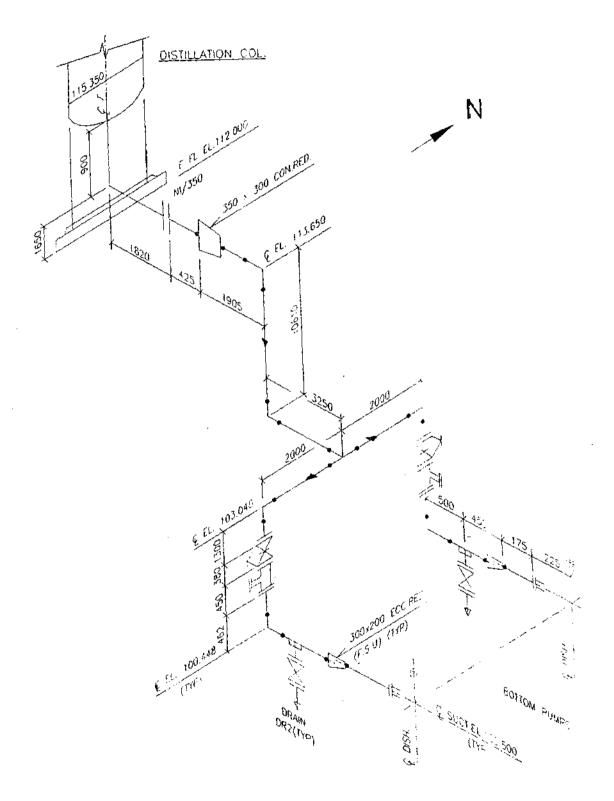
TYPICAL PIPING ISOMETRIC DRAWING
